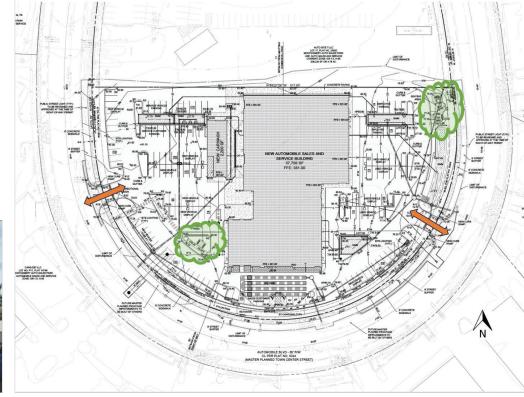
EXISTING AND PROPOSED PARKS AND TRAILS
